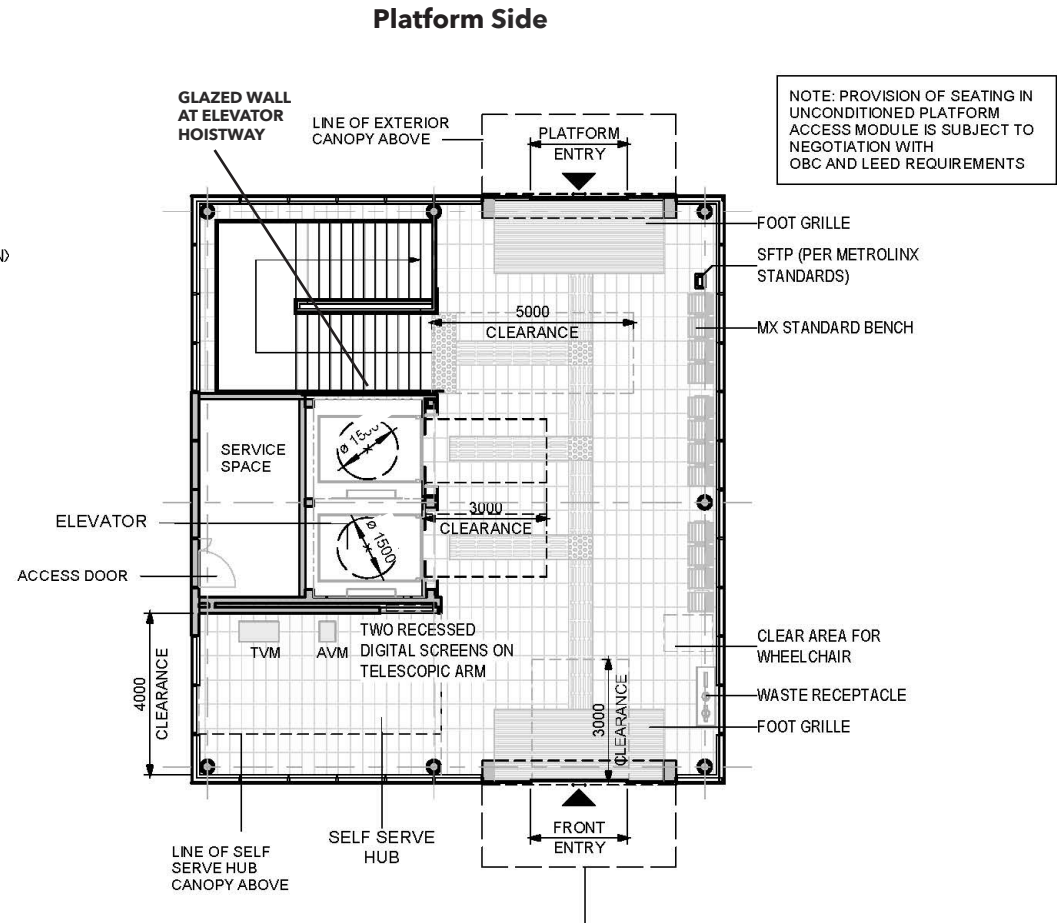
Plan of Platform Access Module at un-staffed Station in a two-elevator scenario. Courtesy Waiting area included.
